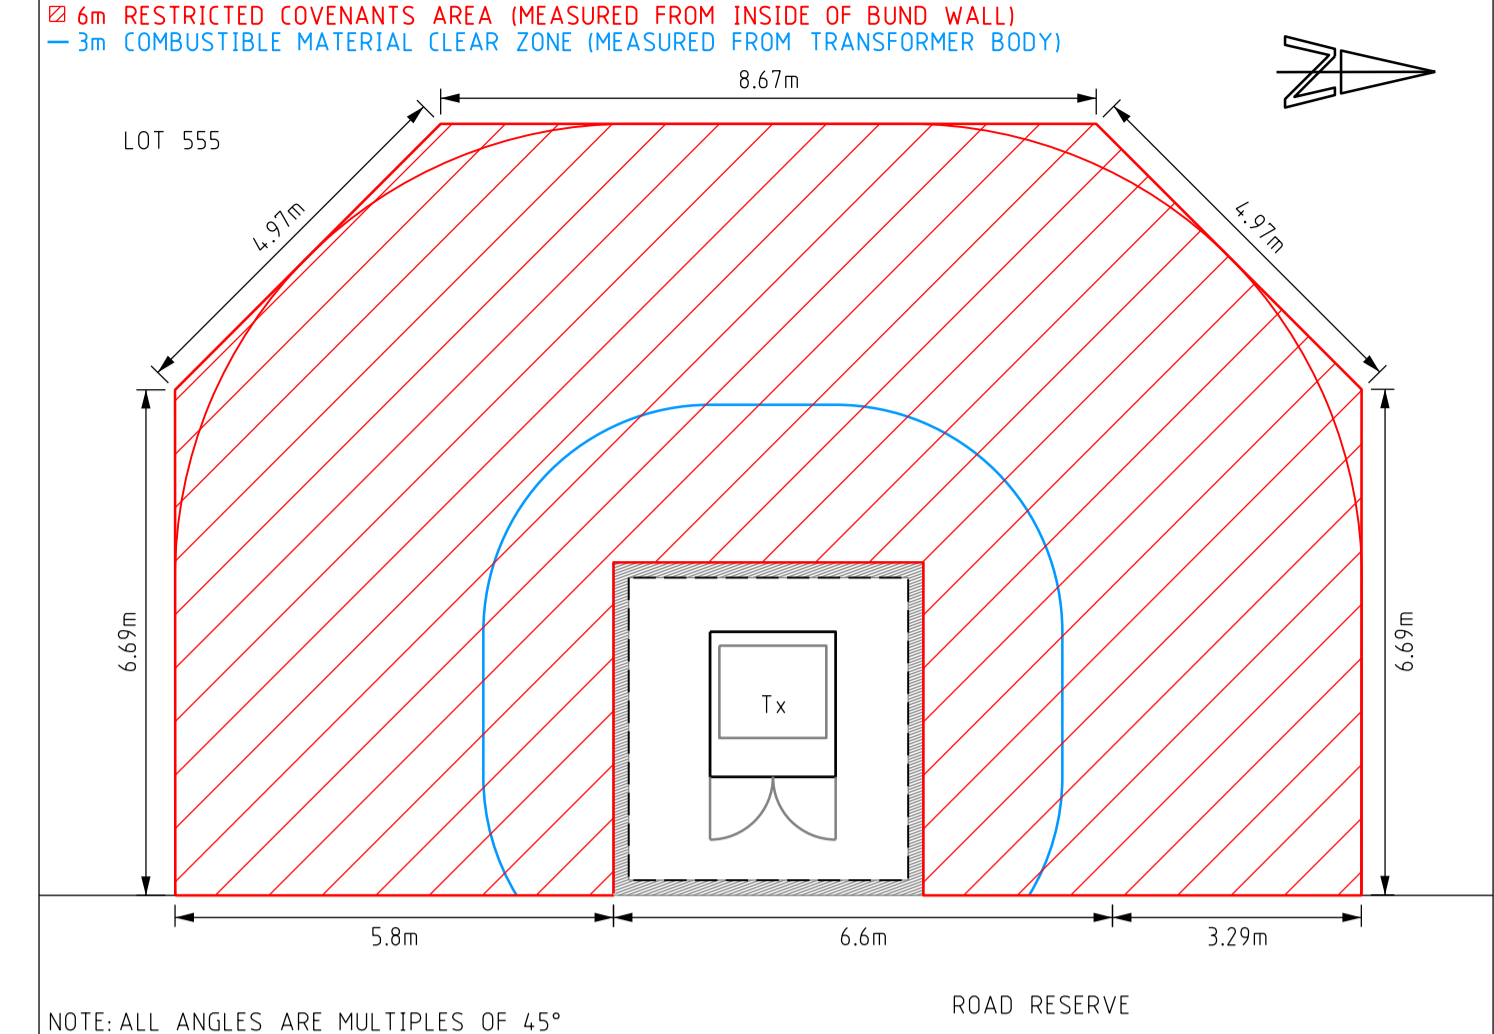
DETAIL A - SUBSTATION SITE LAND REQUIREMENTS
